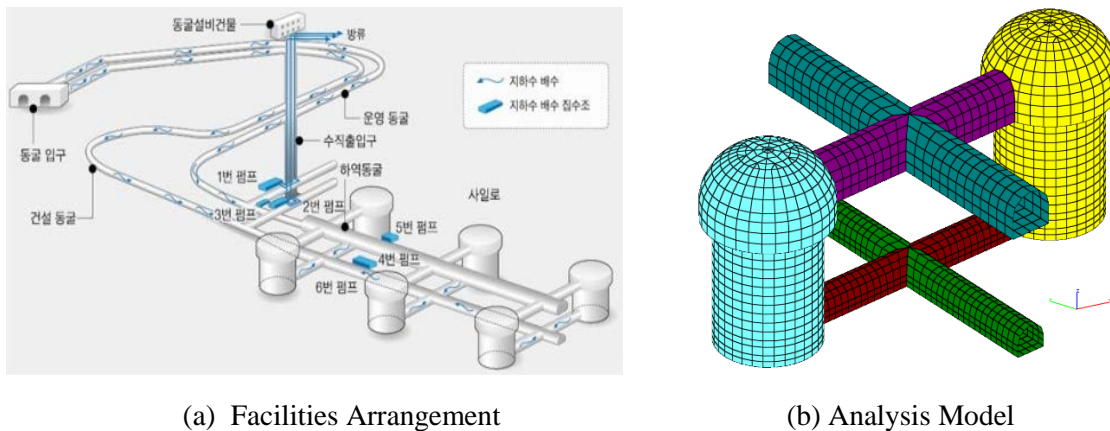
LILW Facilities Arrangement and SSI Analysis Model
